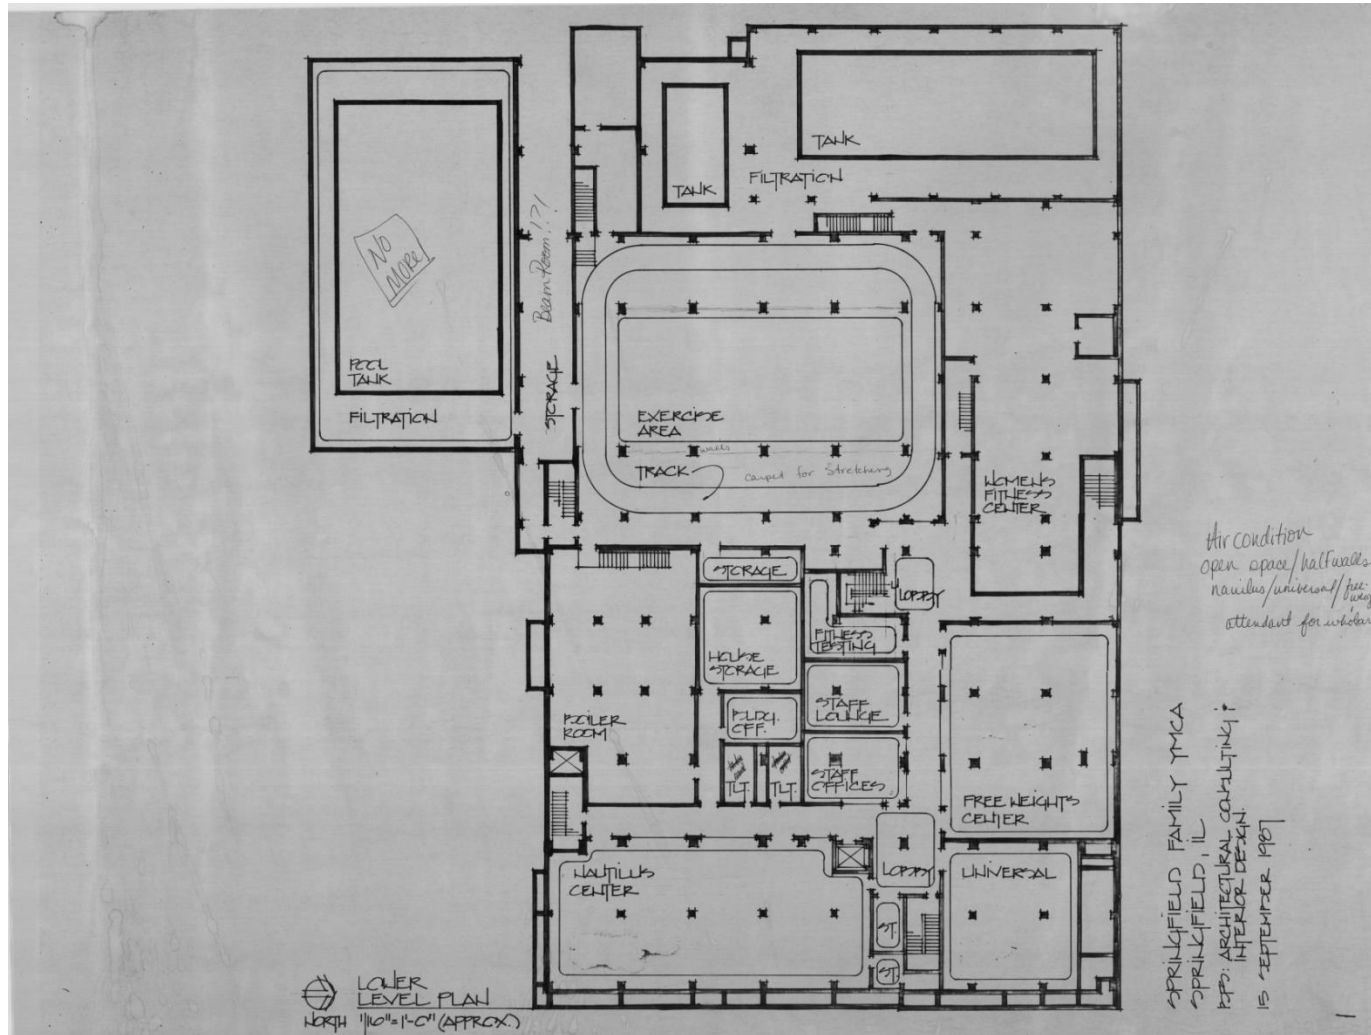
Lower Level Plan (BFS Architectural Consulting and Interior Design 1987, [Sheet No. 1]). The proposed 1985 campaign drive never materialized, and the Building Committee proposed a greatly reduced capital campaign in 1987. The 1987 Campaign Drive was similarly not successful.
